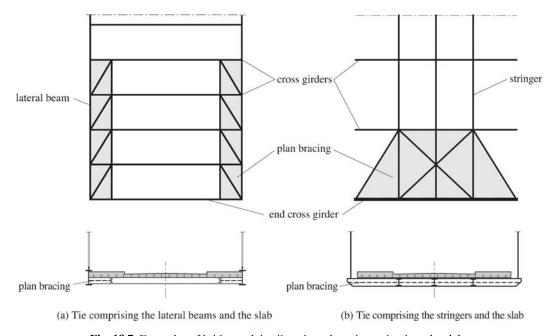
Examples of bridge end details to introduce tie tension into the slab.
